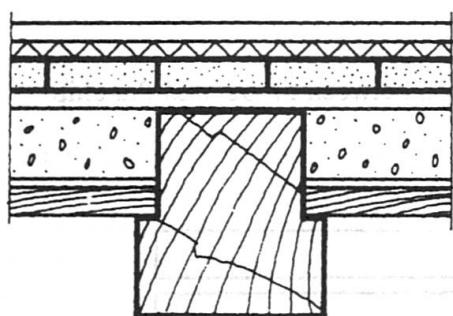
'Salzburger Decke' - 'Salzburg-type floor' after uncovering the existing timber beams
